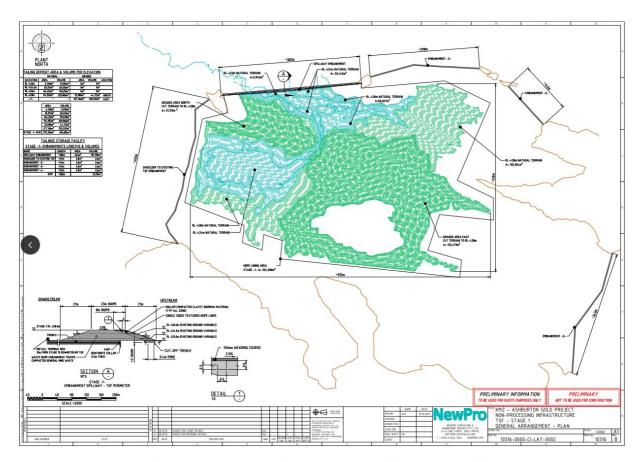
Proposed Location Stage 1 of the Tailings Storage Facility
